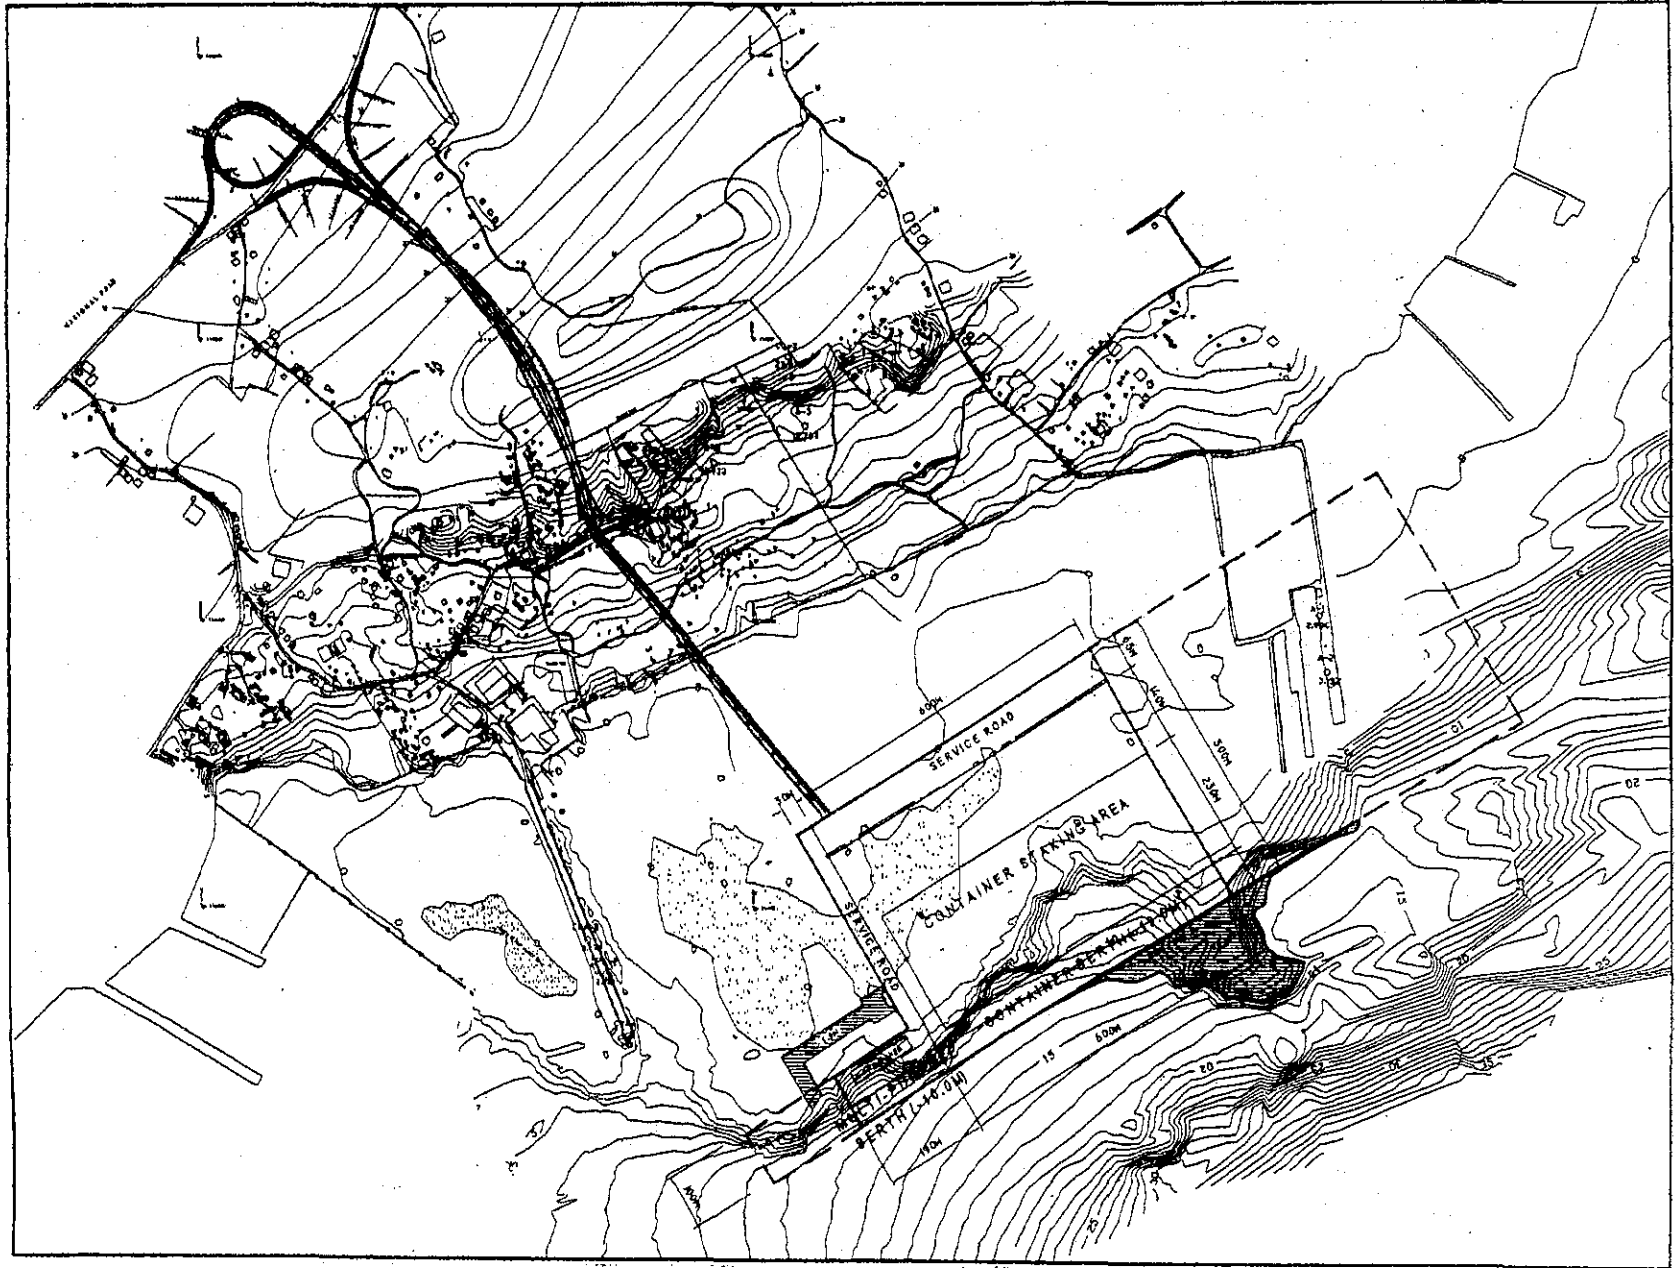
Short-term Development Plan of New Cebu Port(1)
